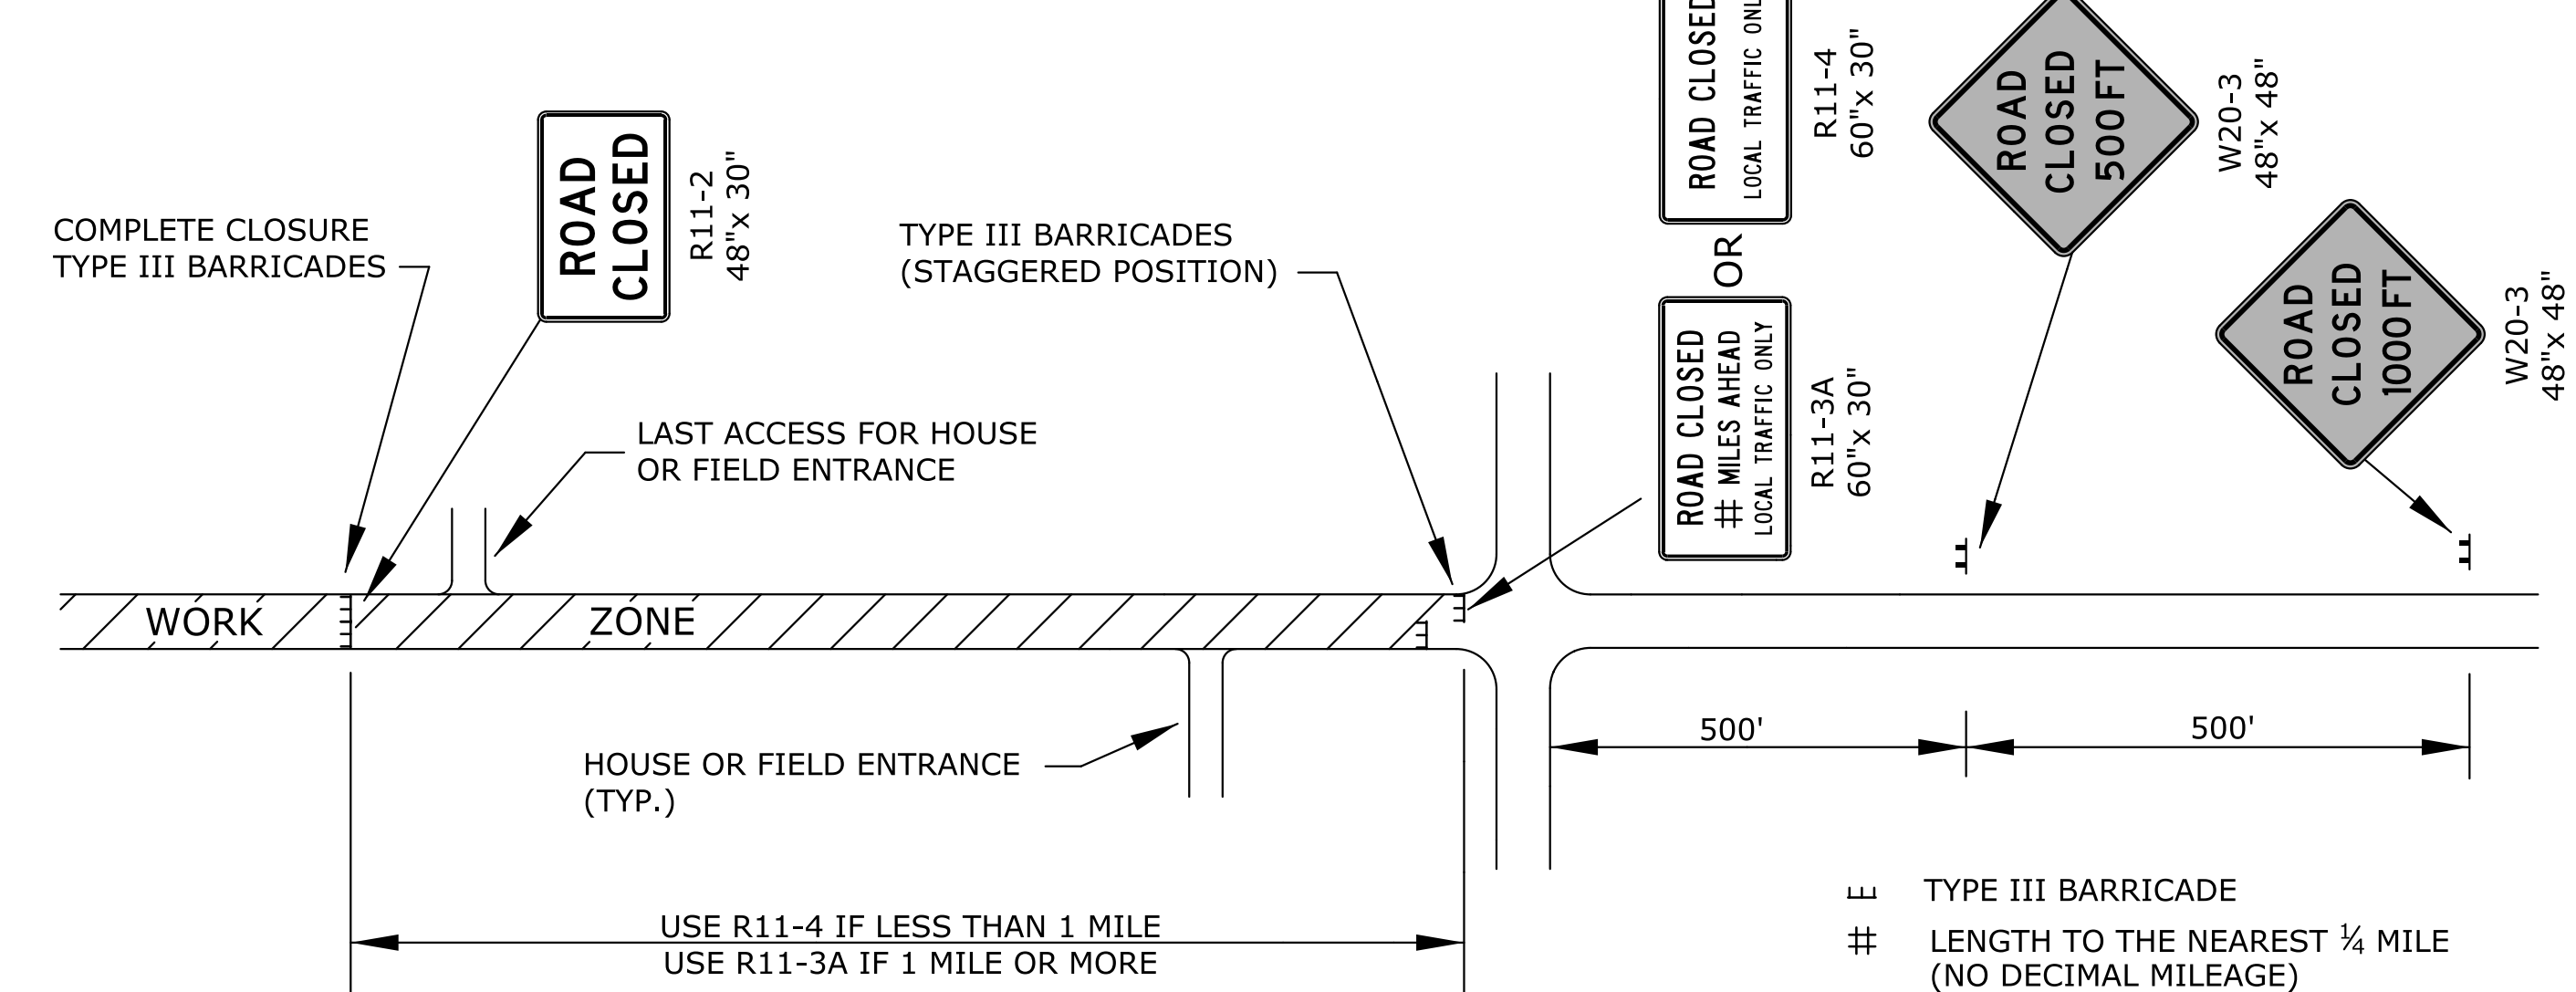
TYPICAL SIGNING FOR ROAD CLOSURE - LOCAL TRAFFIC ACCESS
